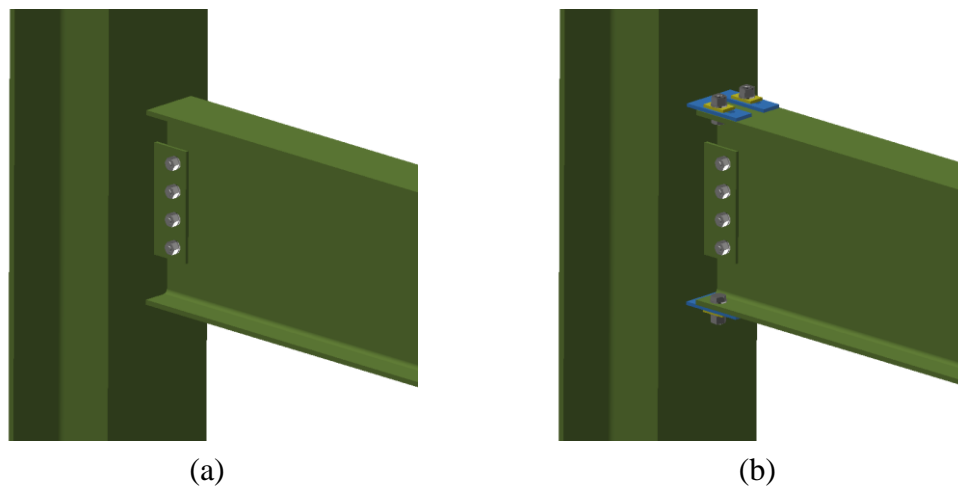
(a) Conventional single-plate shear connection, and (b) enhanced single-plate shear connection incorporating U-shaped slotted top and seat plates welded to column
